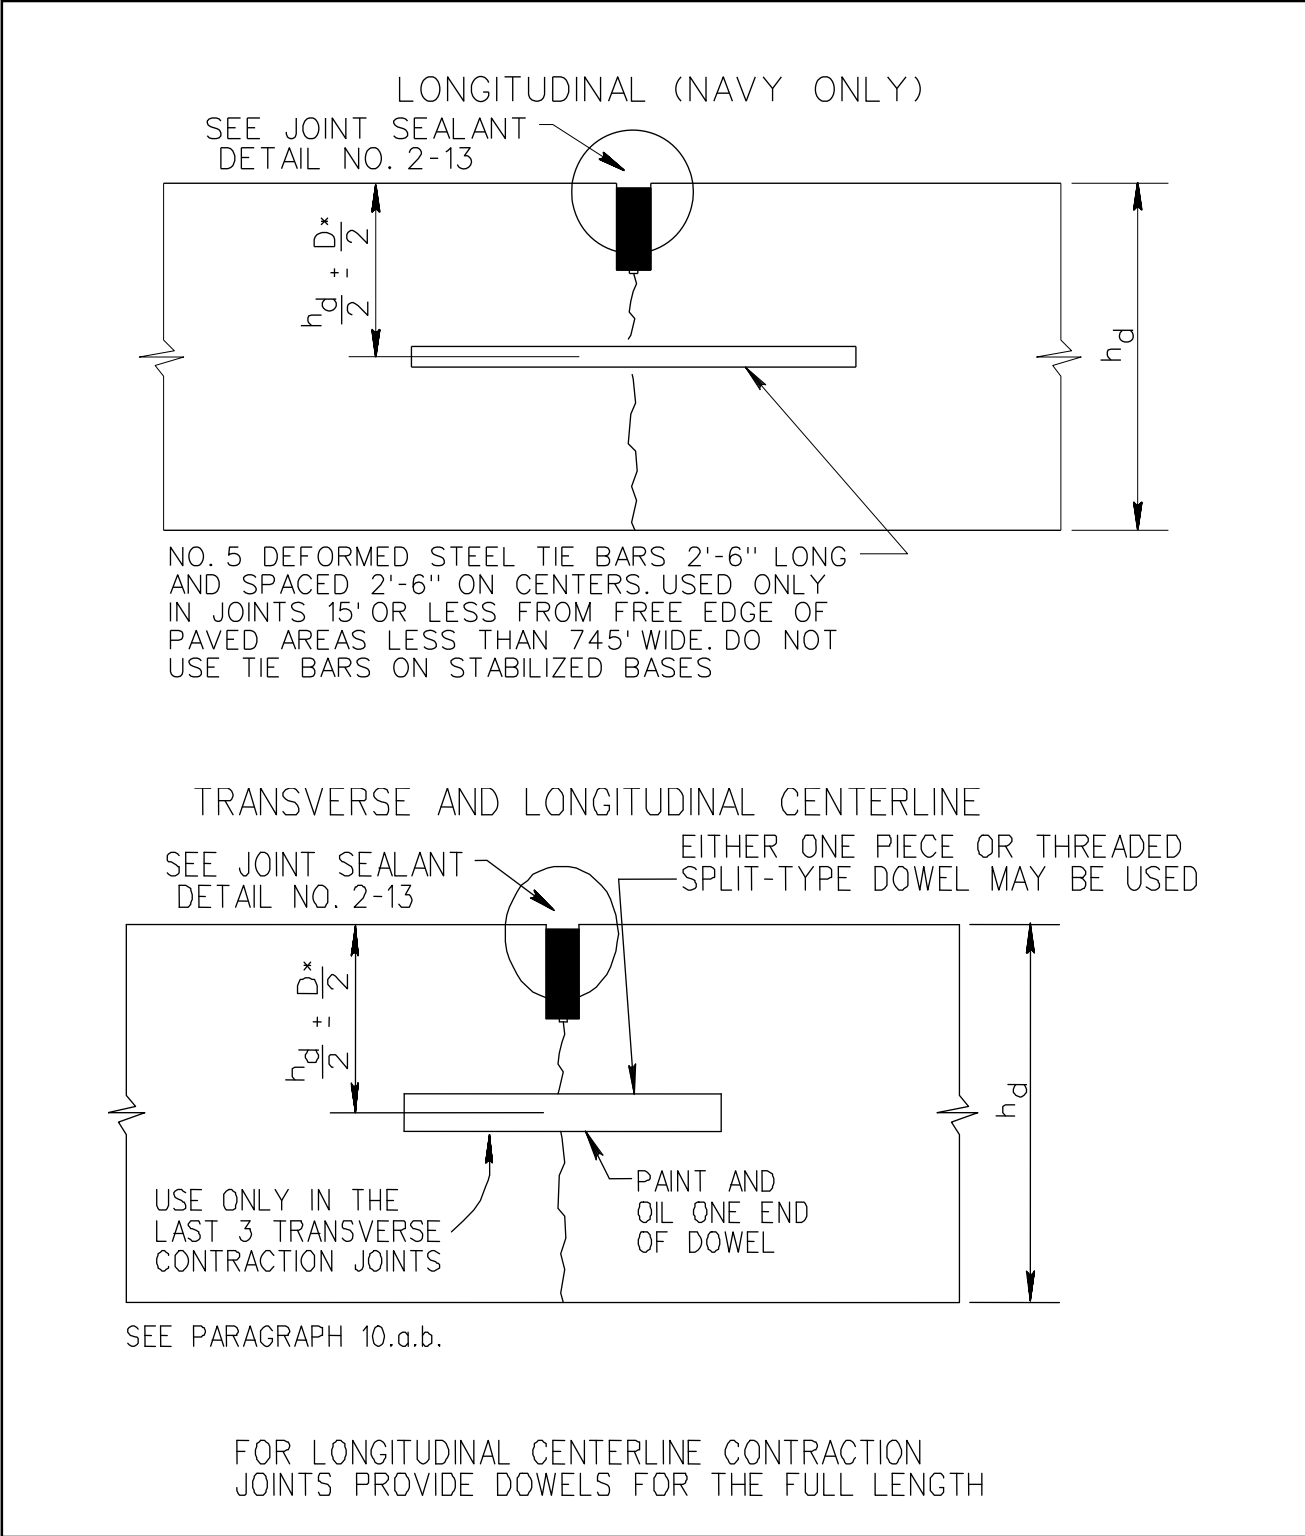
Contraction Joints for Plain Concrete Pavements
